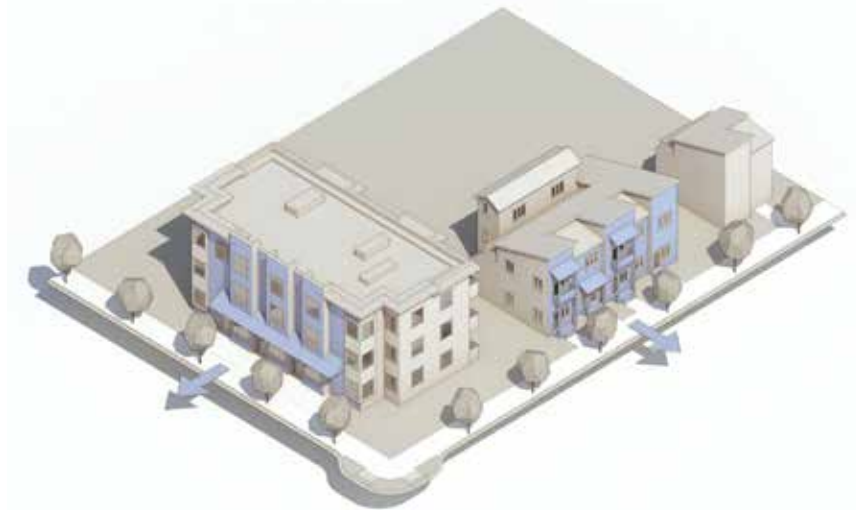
Orient primary building facades and entrances toward the street (see M at right).
